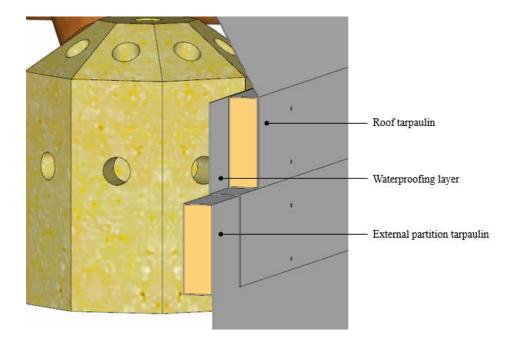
3D sketch showing the nailing of the external partition beam to the roof structure -2
